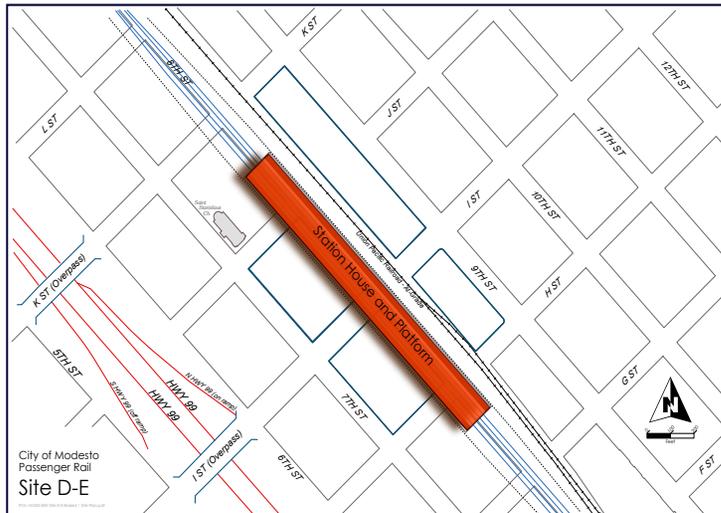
Conceptual Site Plan, Above-Grade Passenger Rail, Upper Level Station House
